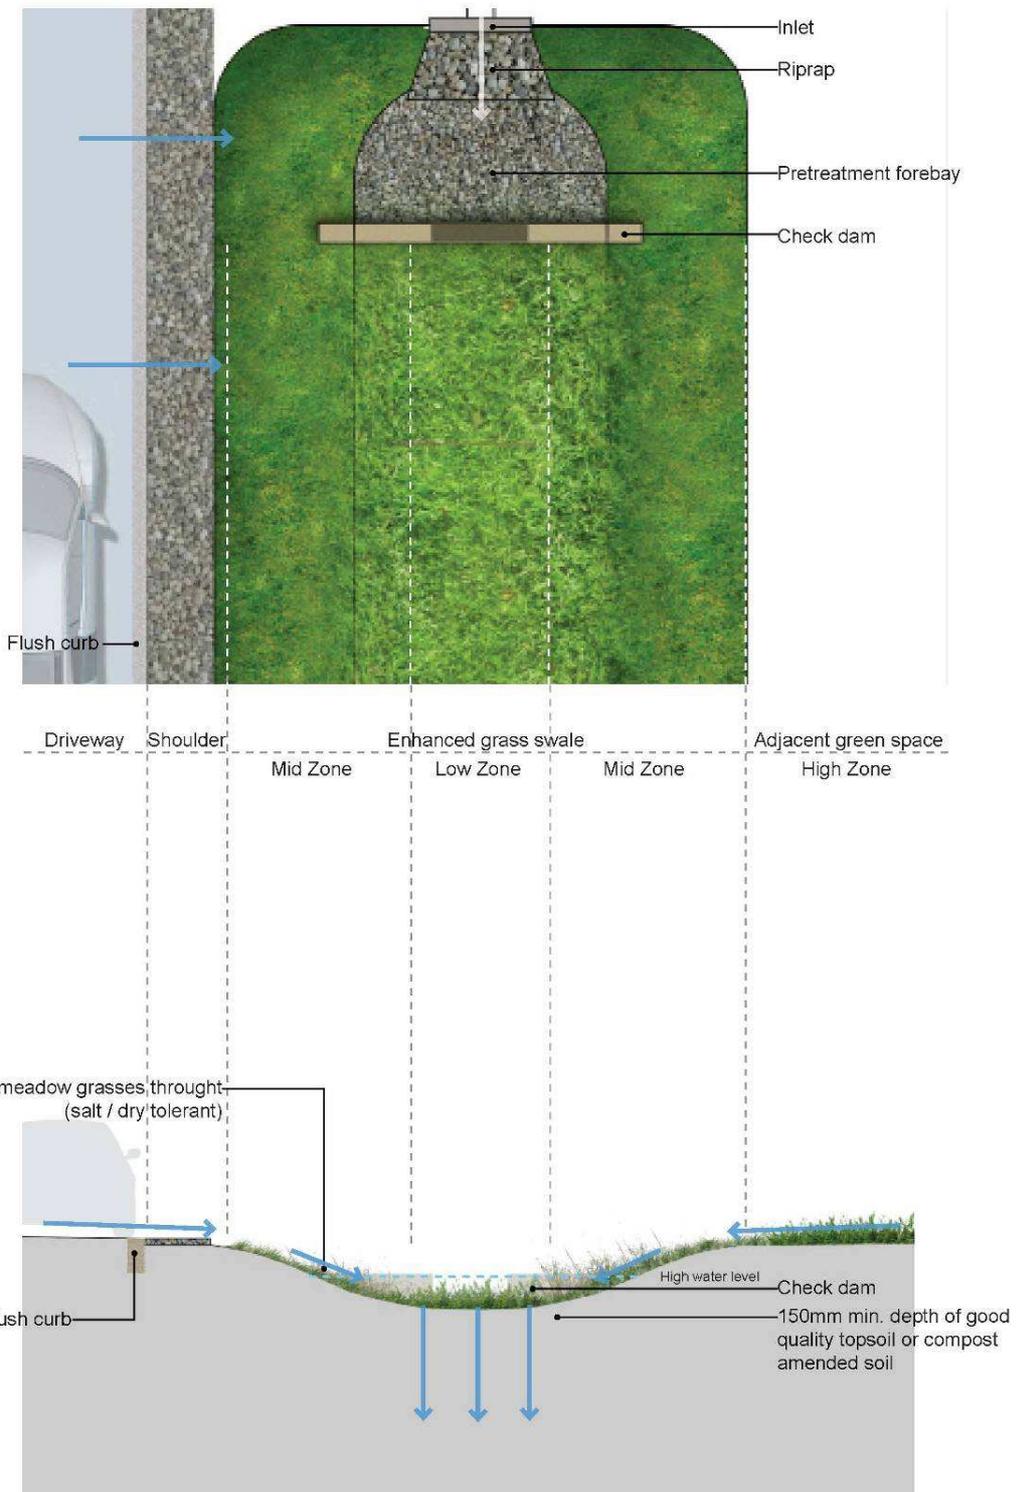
An enhanced grass swale plan view and cross-section; sizing and layout guidance is provided in the LID Stormwater Management Planning and Design Guide.
